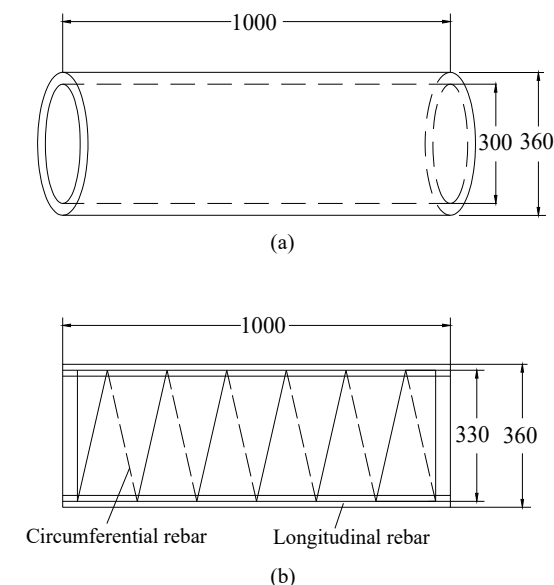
Specimen dimensions: (a) concrete; (b) rebars (mm).
